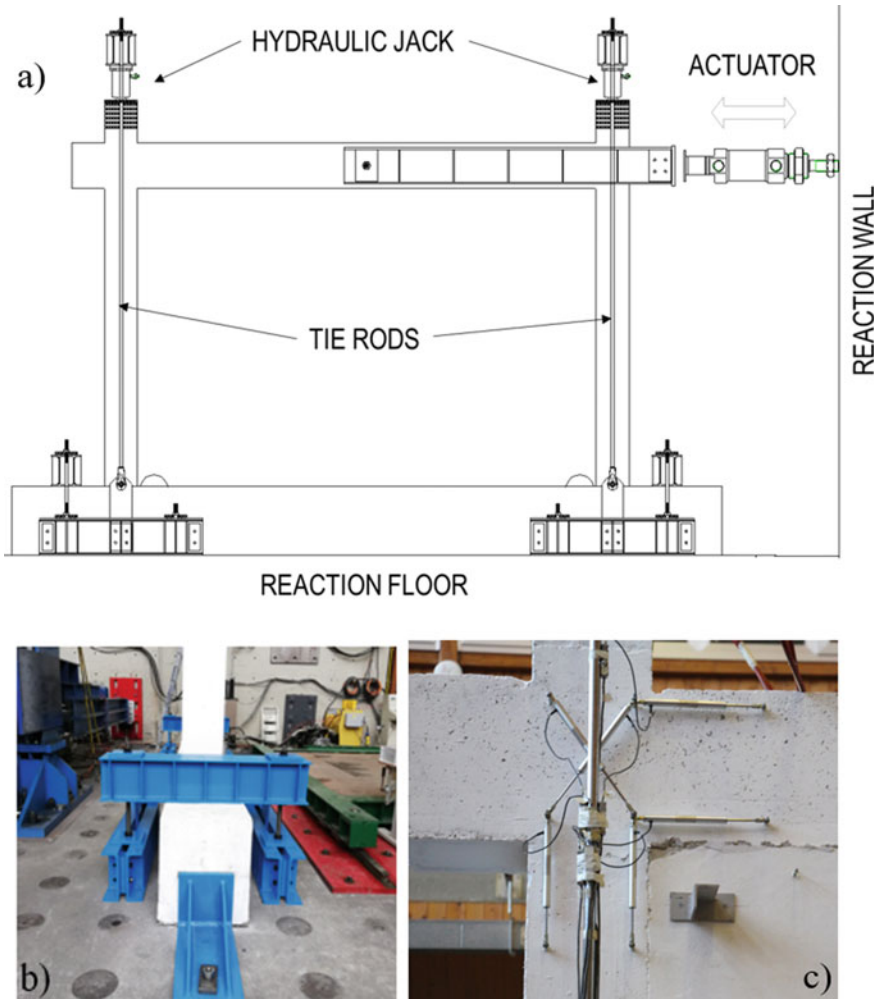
a) Whole test apparatus, b) restraint system of the foundation beam and c) LVDT sensors applied to a beam-column joint, beam and column ends
